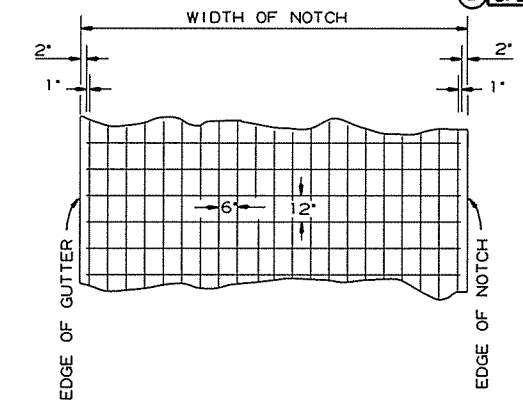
DETAIL OF TURNOUTS, ASPHALT STREETS, COUNTY ROADS & STATE HIGHWAYS CURB & GUTTER SECTION
